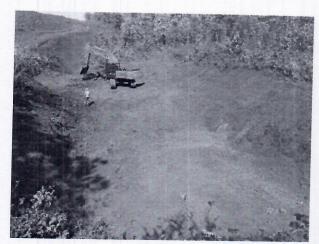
Haul road maintenance by Grader application AND Photo #5 Showing Trucks and Dumpers Covered With Tarpaulin
